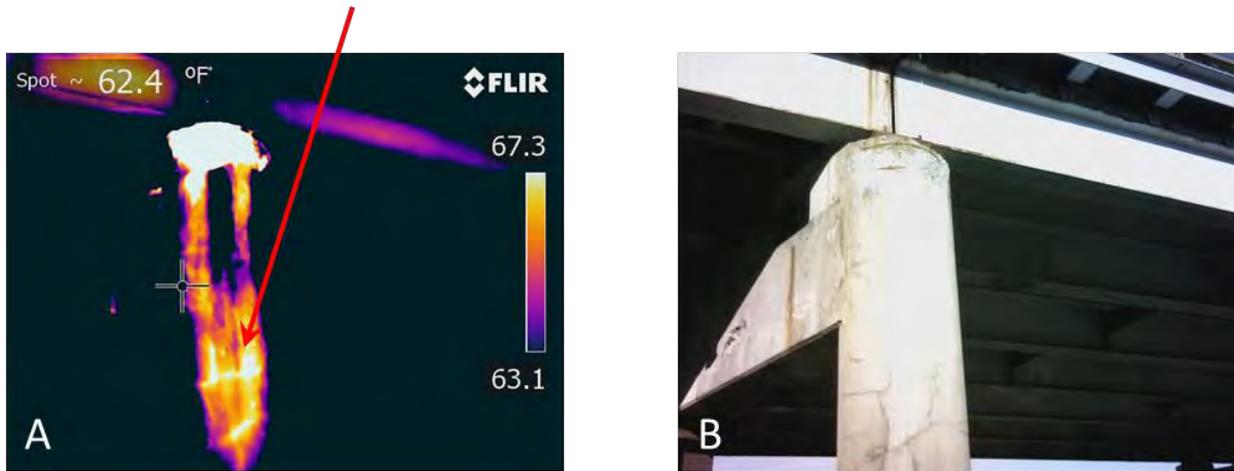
IR (A) and digital (B) images of a delaminated column on Pier 1 of South Bridge
